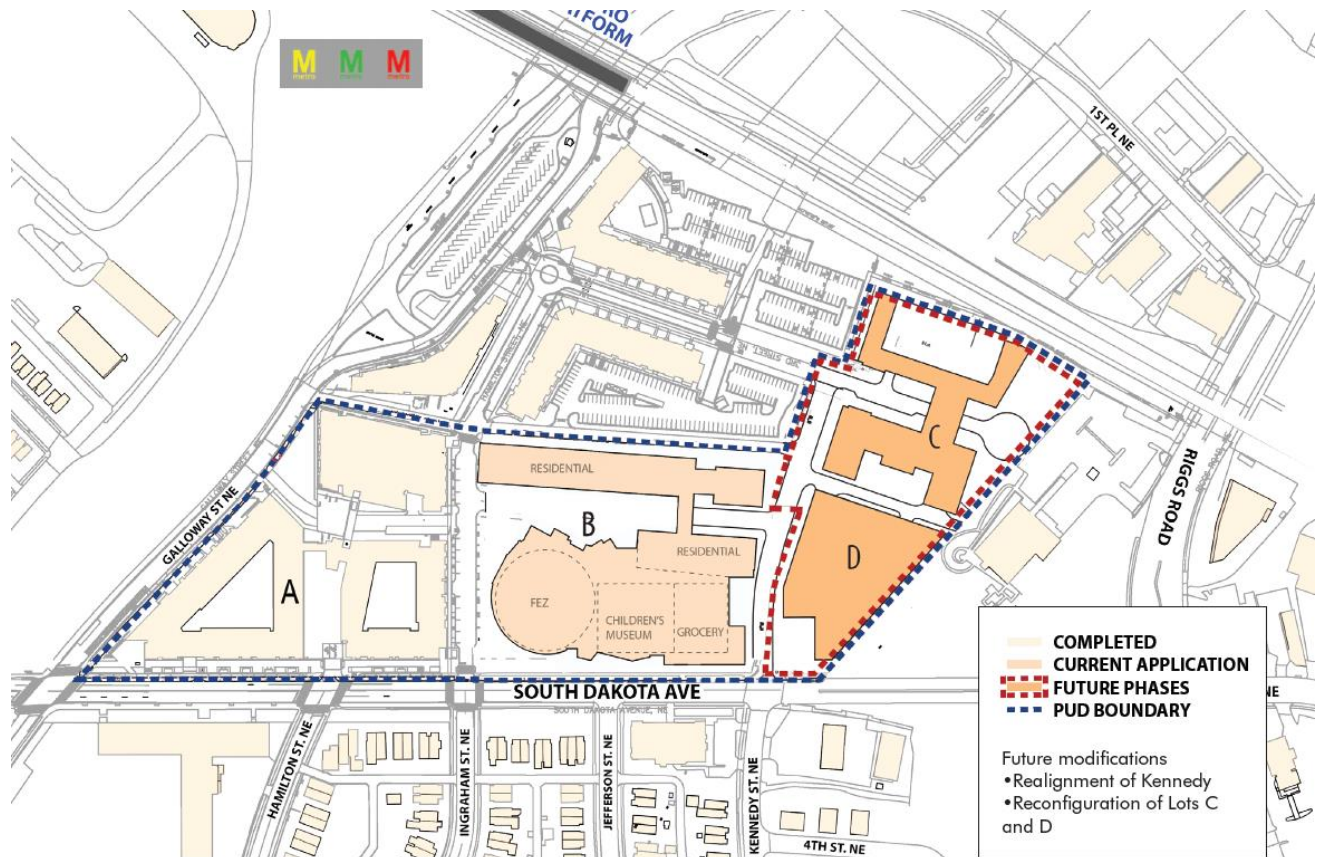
Future Overall PUD Site Plan After Approval of 2<sup>nd</sup> Stage Building Phase B and With Approved Stage 1 Future
